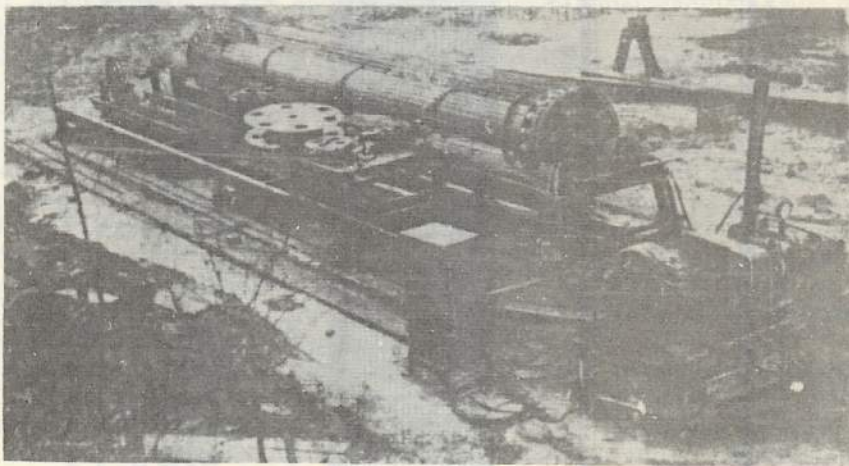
Shuttle-type machine for prestressing the reinforcement of hollow piles
